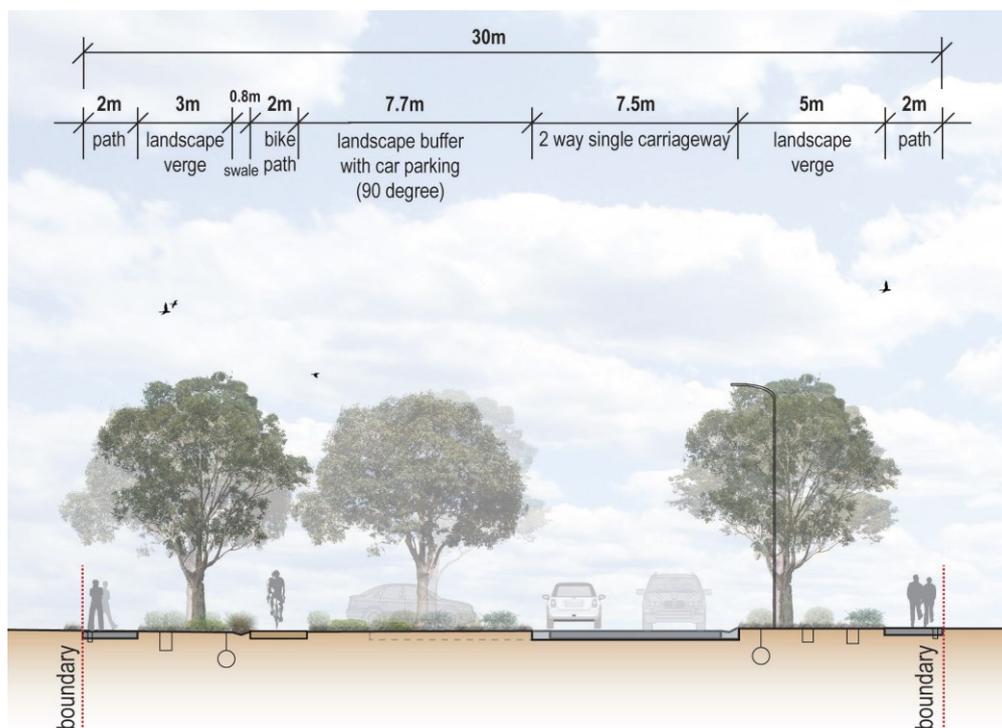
Sixteenth Street Greenway Cross Section. Adopted from Mildura South (Sixteenth & Deakin West) Development Plan 2014.
